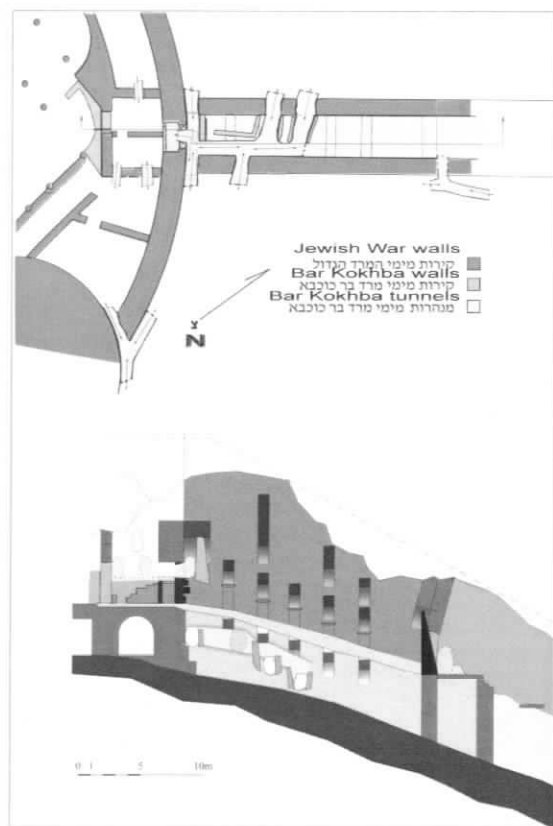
Plan and cross-section of the entrance hall to the palace fortress during the Bar Kokhba Revolt
